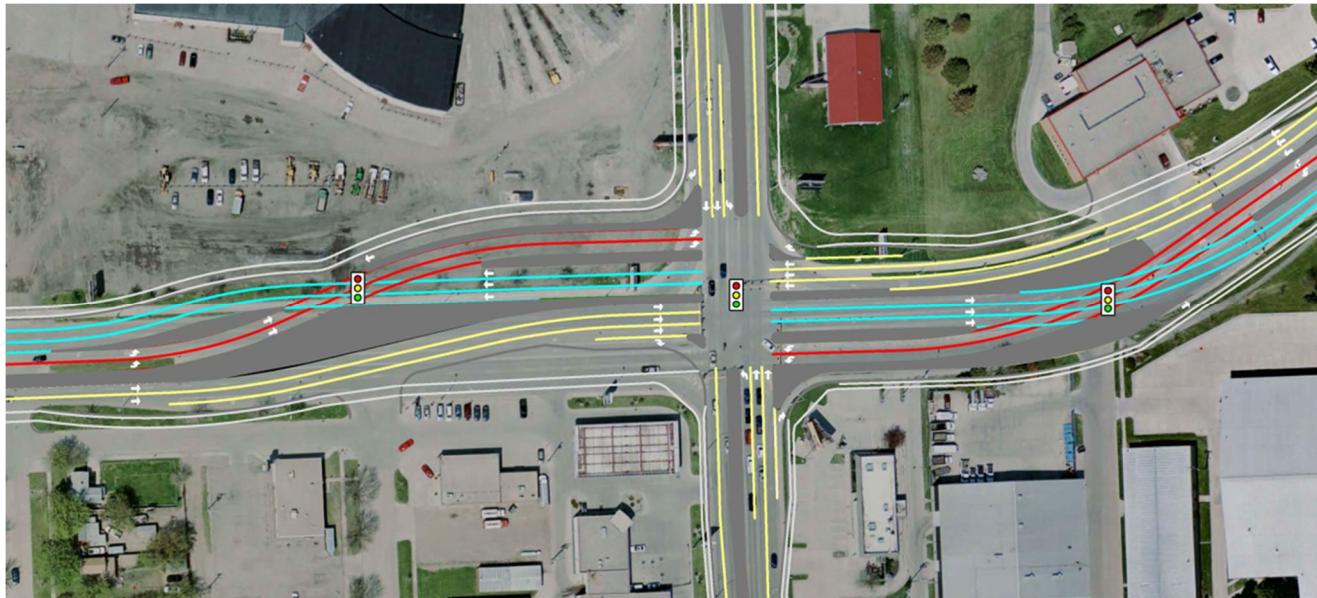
Continuous Flow Intersection Concept at S Washington Street and Demers Avenue
